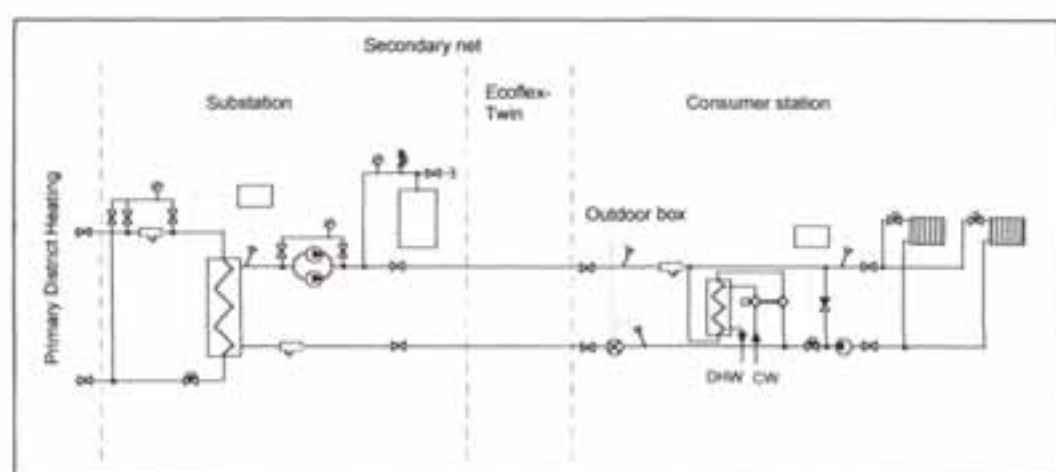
System layout for connection of 44 detached houses to district heating, Munksundet, Enköping.
